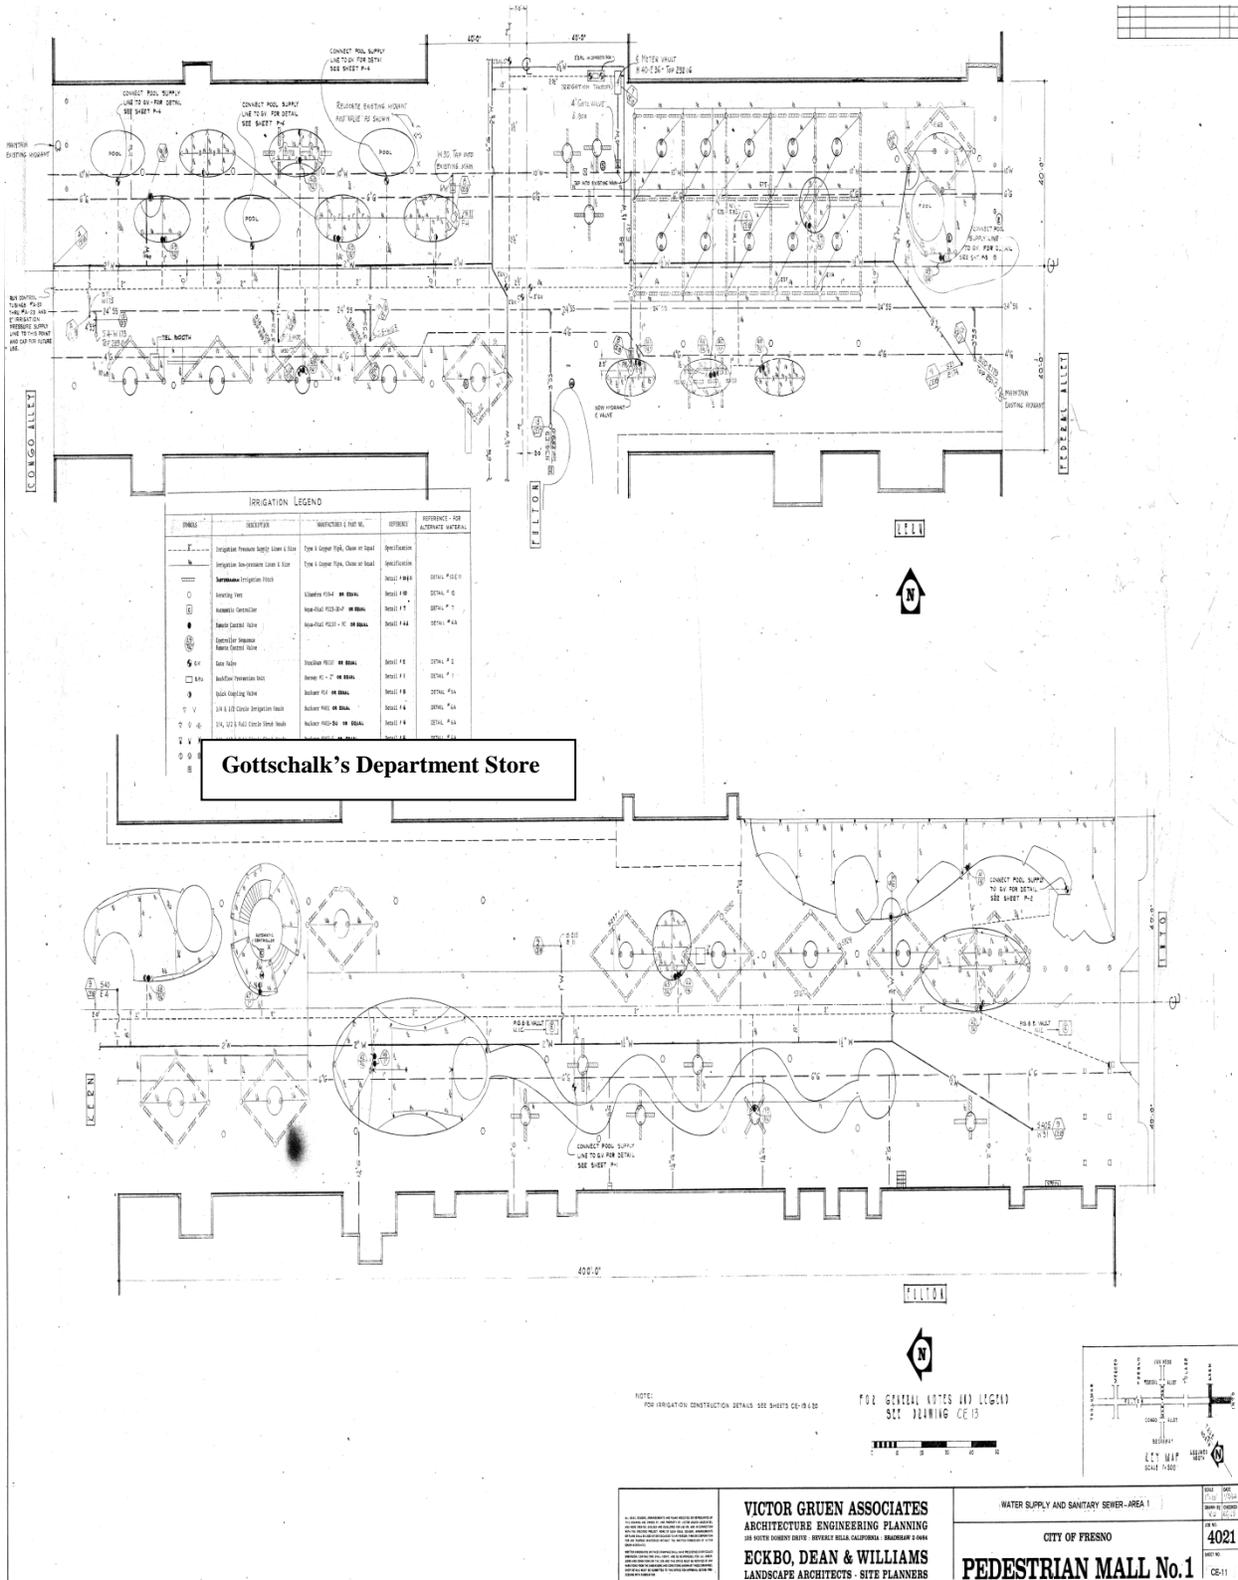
1964 Water Supply and Sanitary Sewer Plans – Area 1
